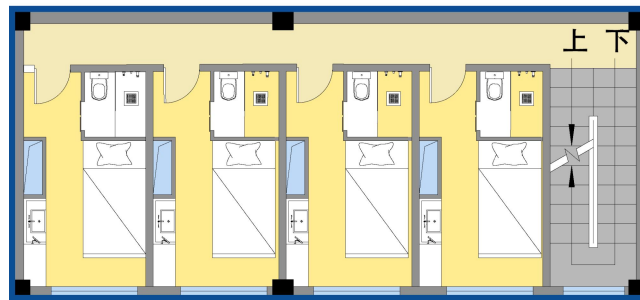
33Renovated Floor Plan of the Building Unit 1:50
